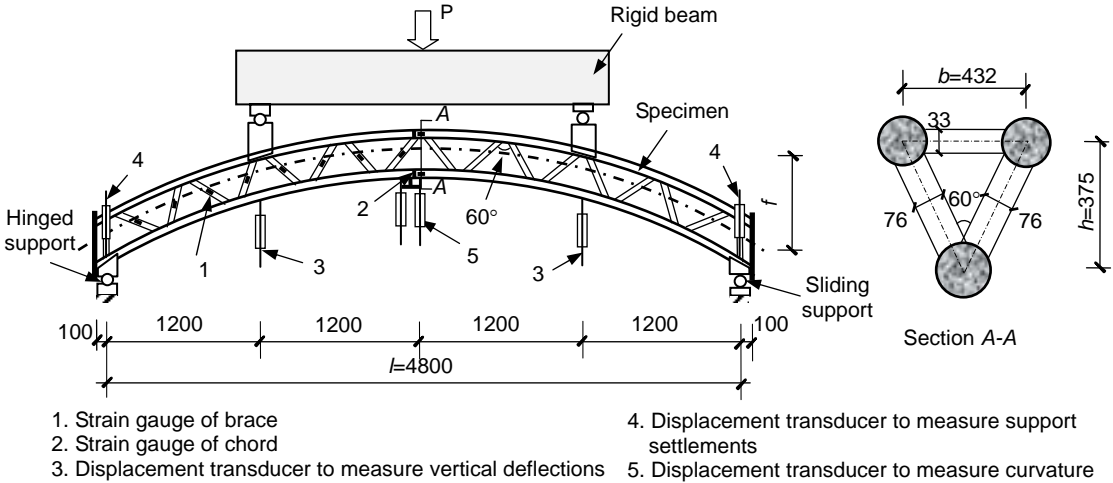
Test set-up and specimen configuration (Unit: mm)
